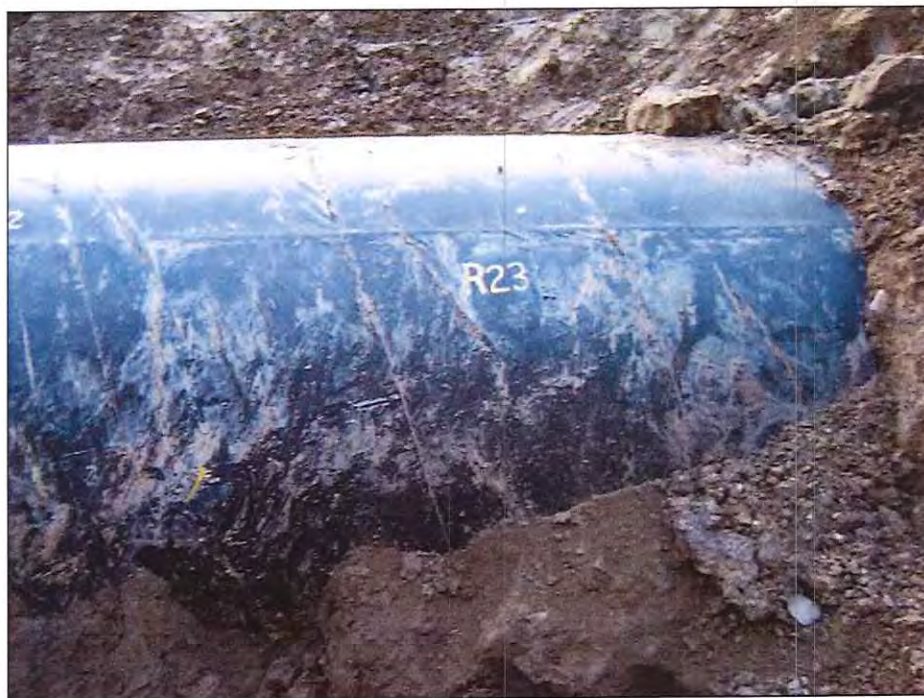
• Site 2. Disbonded Coating at Longitudinal Weld. Looking South – 06.
